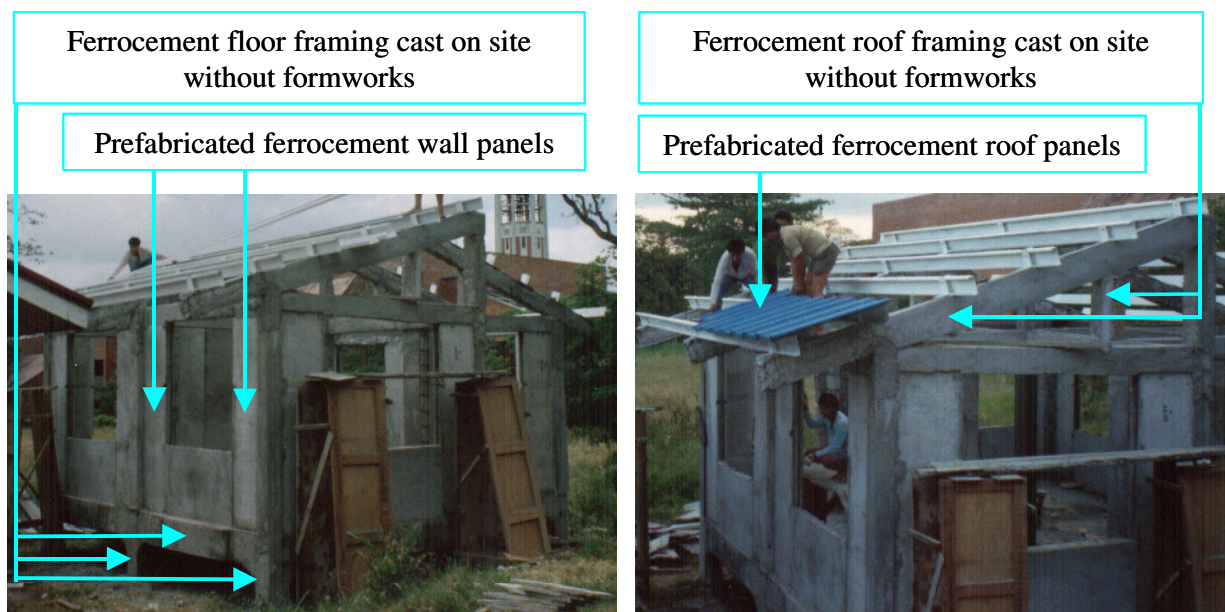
House made of prefabricated and cast-in-situ ferrocement components.
